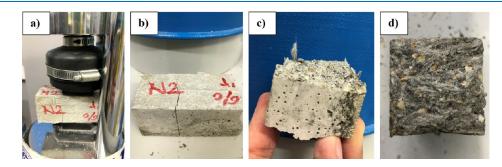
Fracture modes and chopped fiber behavior after fracture: (a,b) fracture modes, (c) fracture surface, and (d) chopped fiber on the surface.
